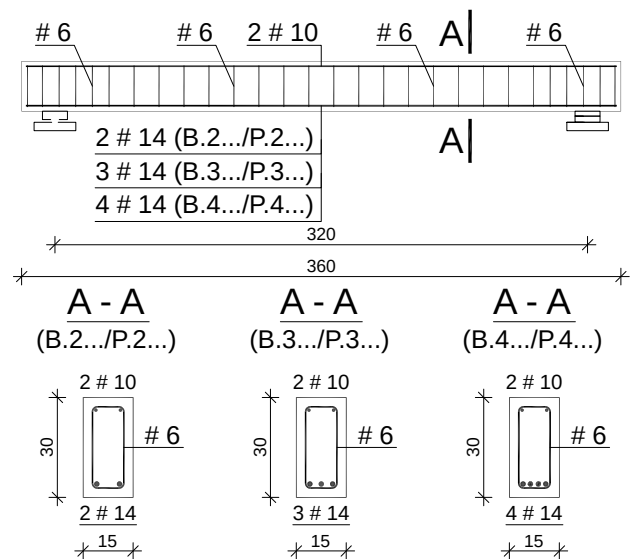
Dimensions and arrangement of rebars in the RC beams (dimensions in cm)
